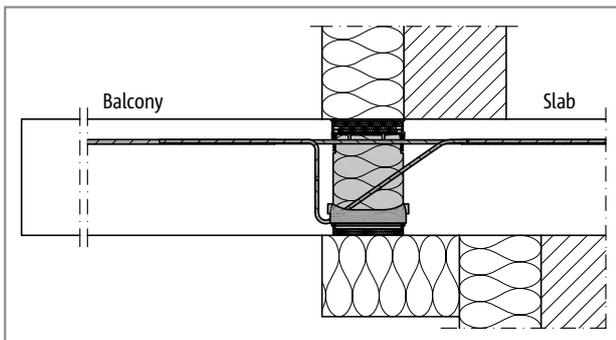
Schöck Isokorb® XT type K: Connection for indirectly positioned floor and TICS
